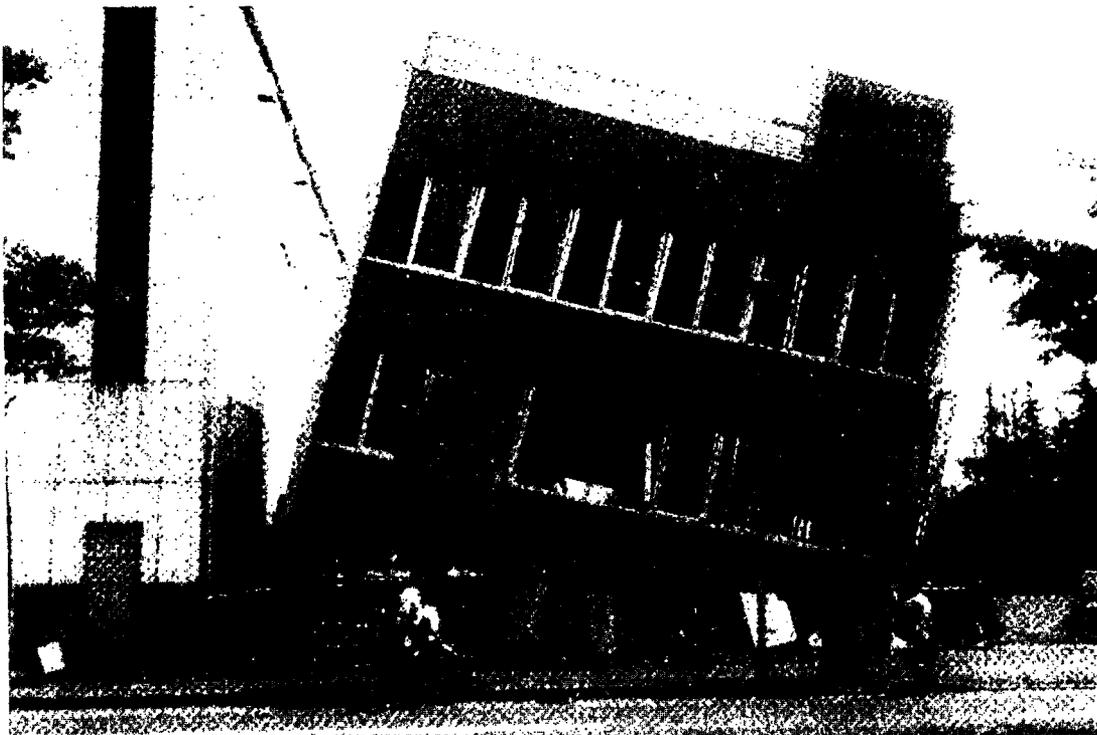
Obisan Building, viewed from the North. This three story reinforced concrete frame building had a heavy eccentric stairwell cantilevered over the column line at the right end of the building.
